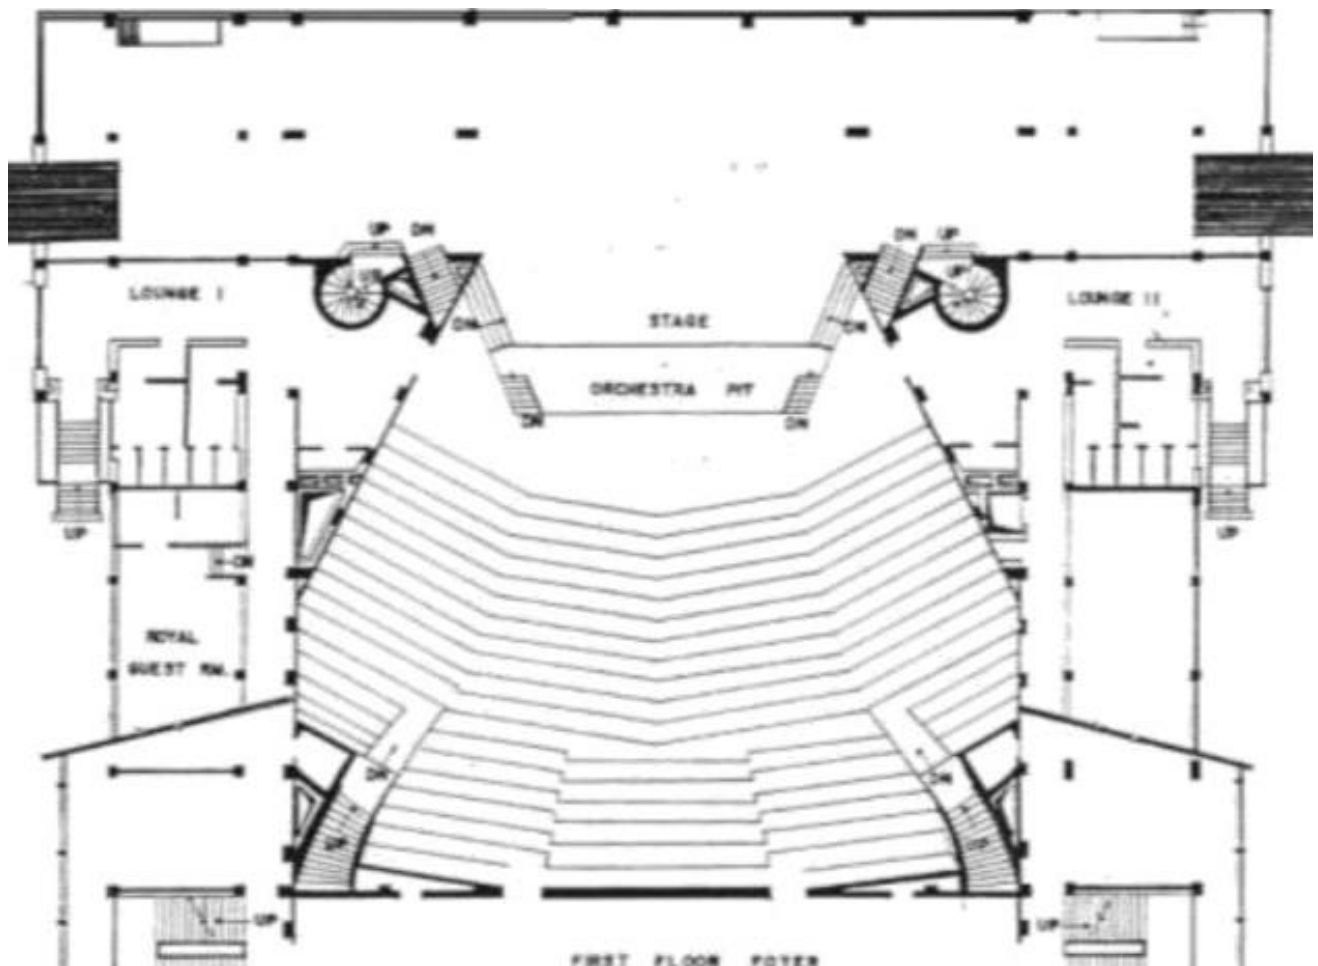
Ground Floor Plan of Nepal Academy Hall
